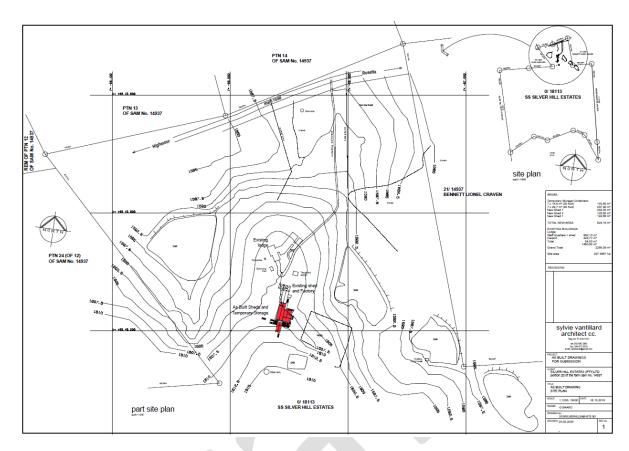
Site plan of the Silver Hill Estate Infrastructure
